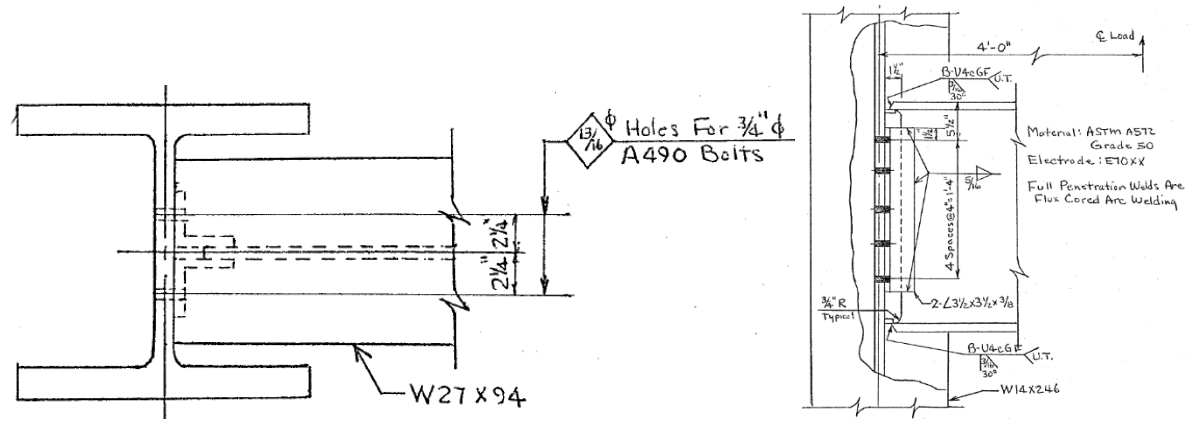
Flange-welded web-welded connection of specimen MRC-RenA572-W-14-2 (Rentschler et al. 1978)
